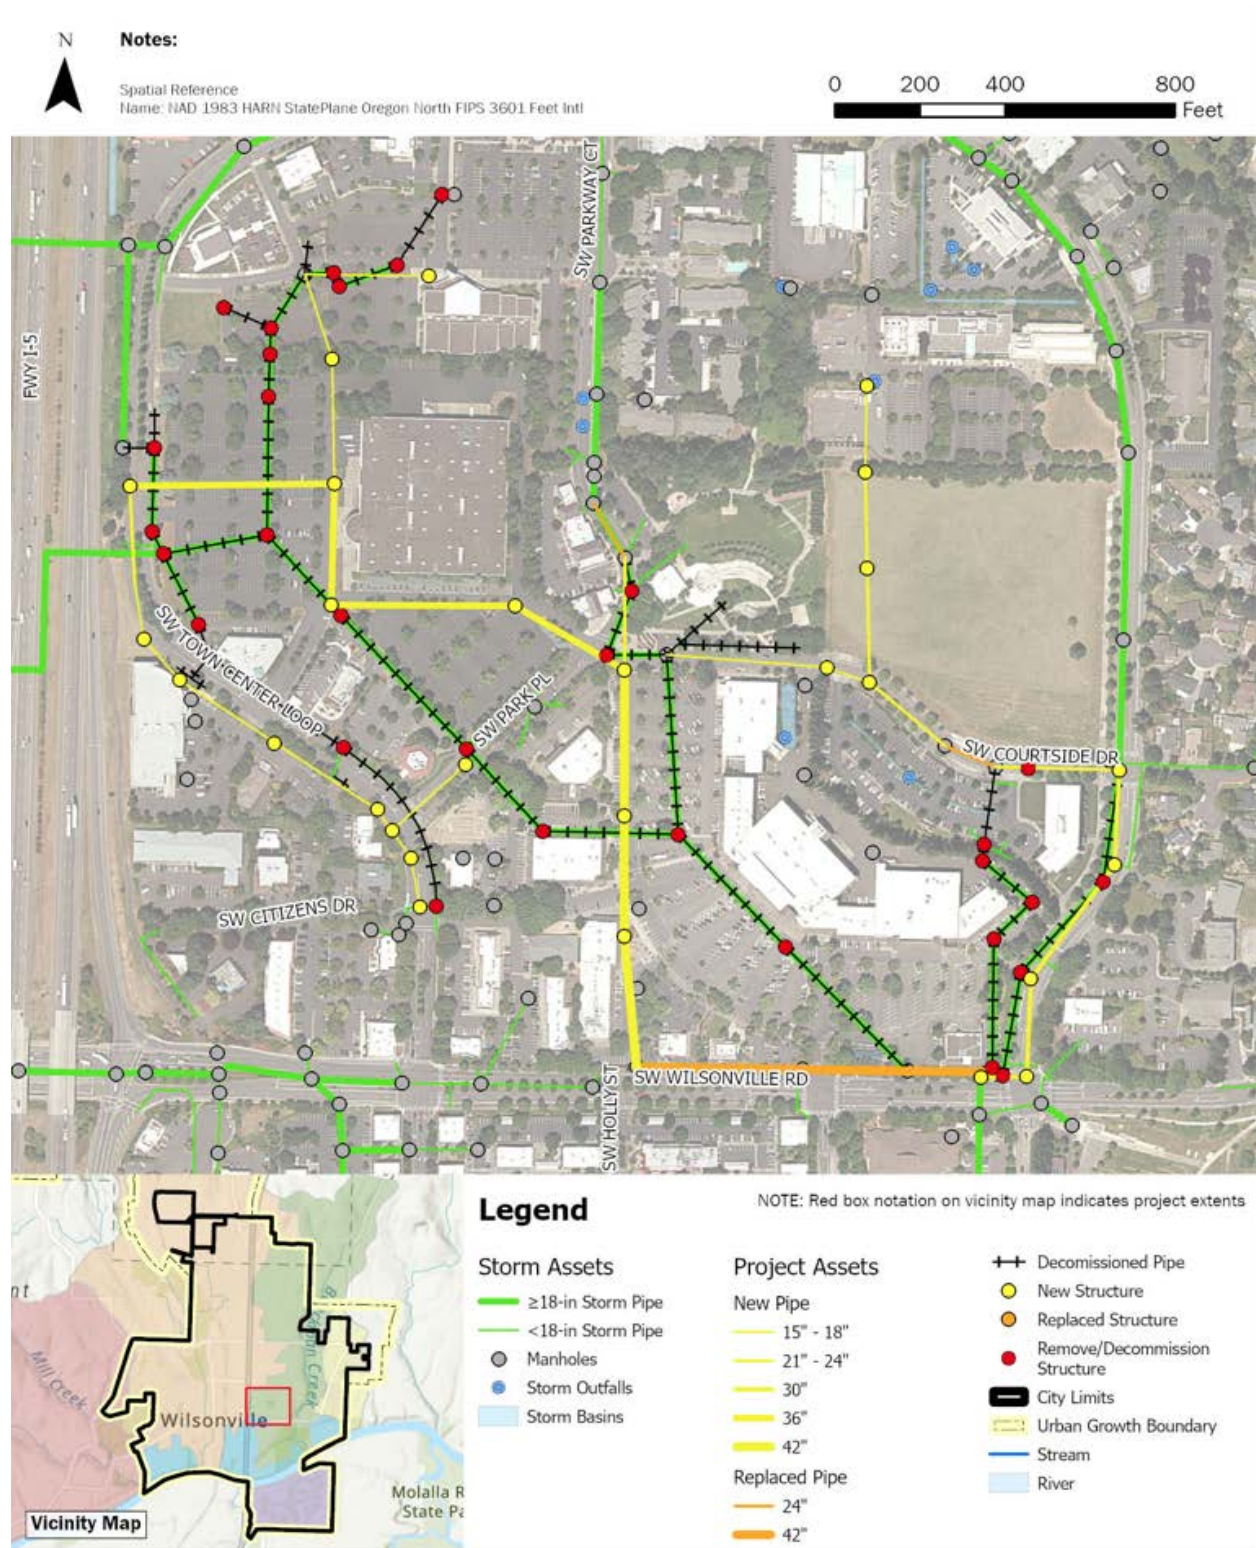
Town Center Stormwater Infrastructure Proposal
